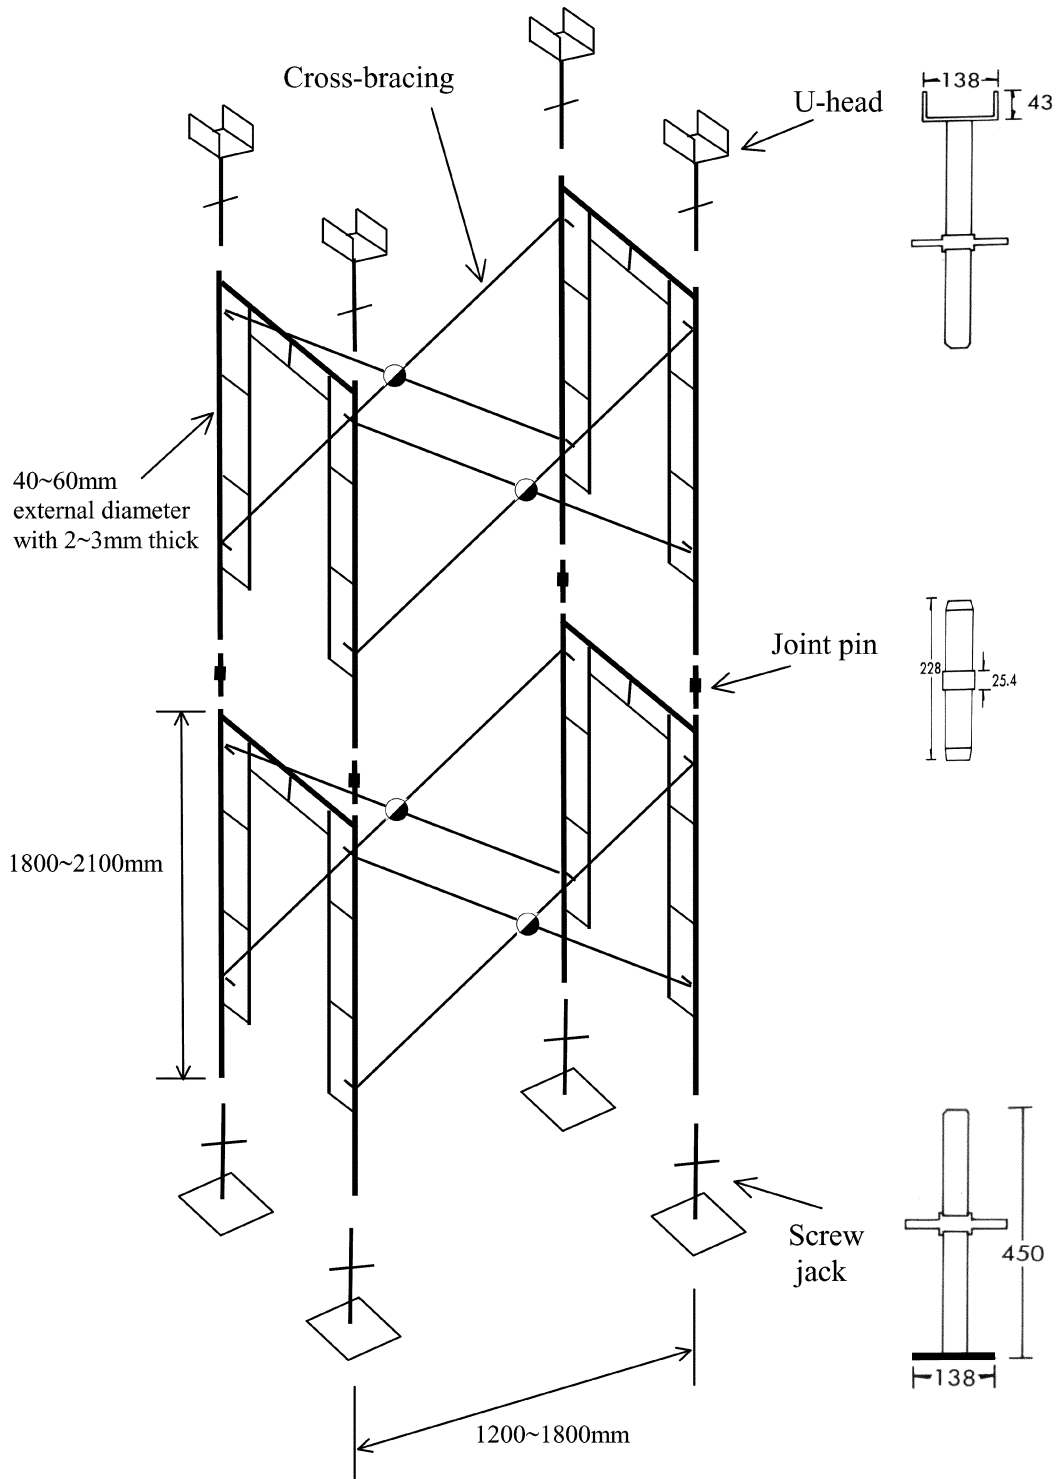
General arrangement of multi-storey door-type modular steel scaffolds with typical dimensions
